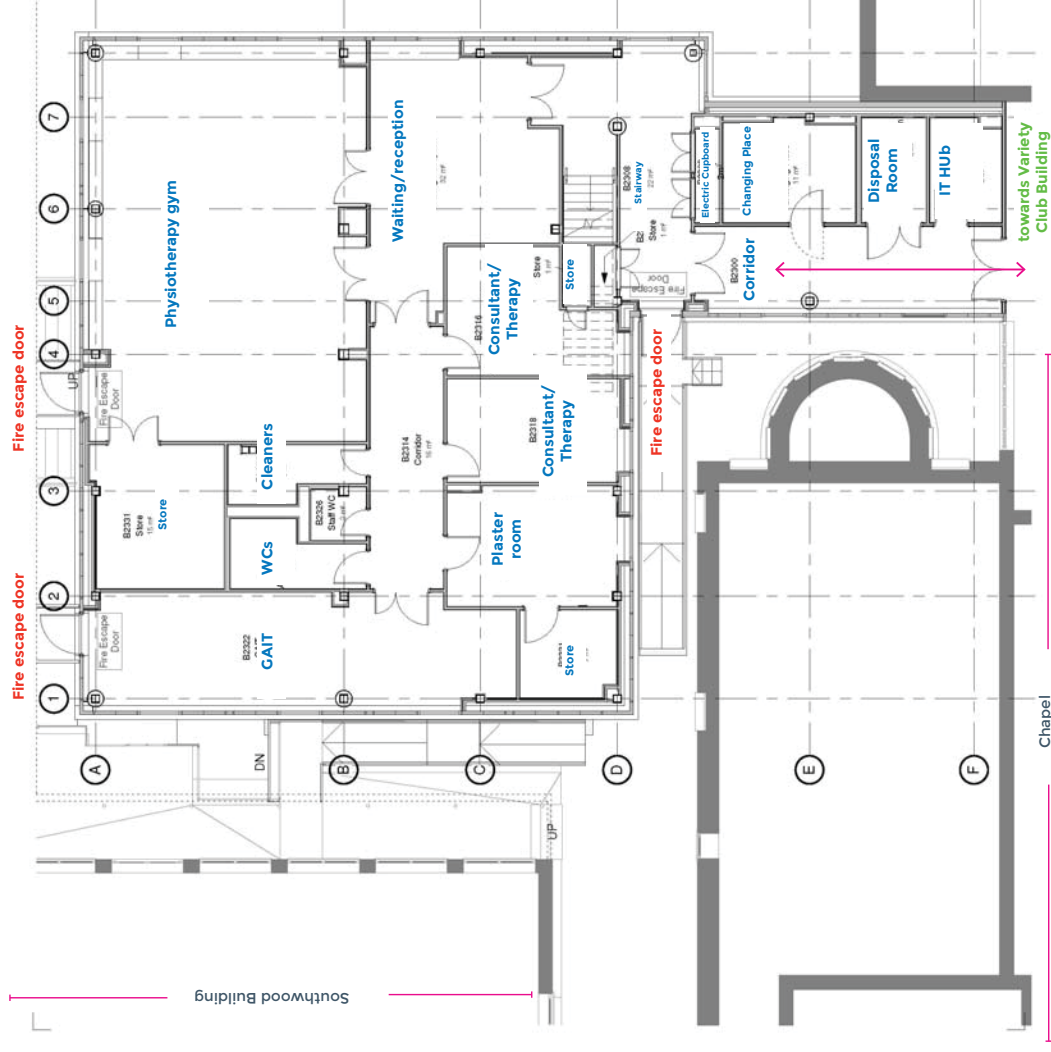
Proposed floor plan at Level 2 (Ground Floor)
